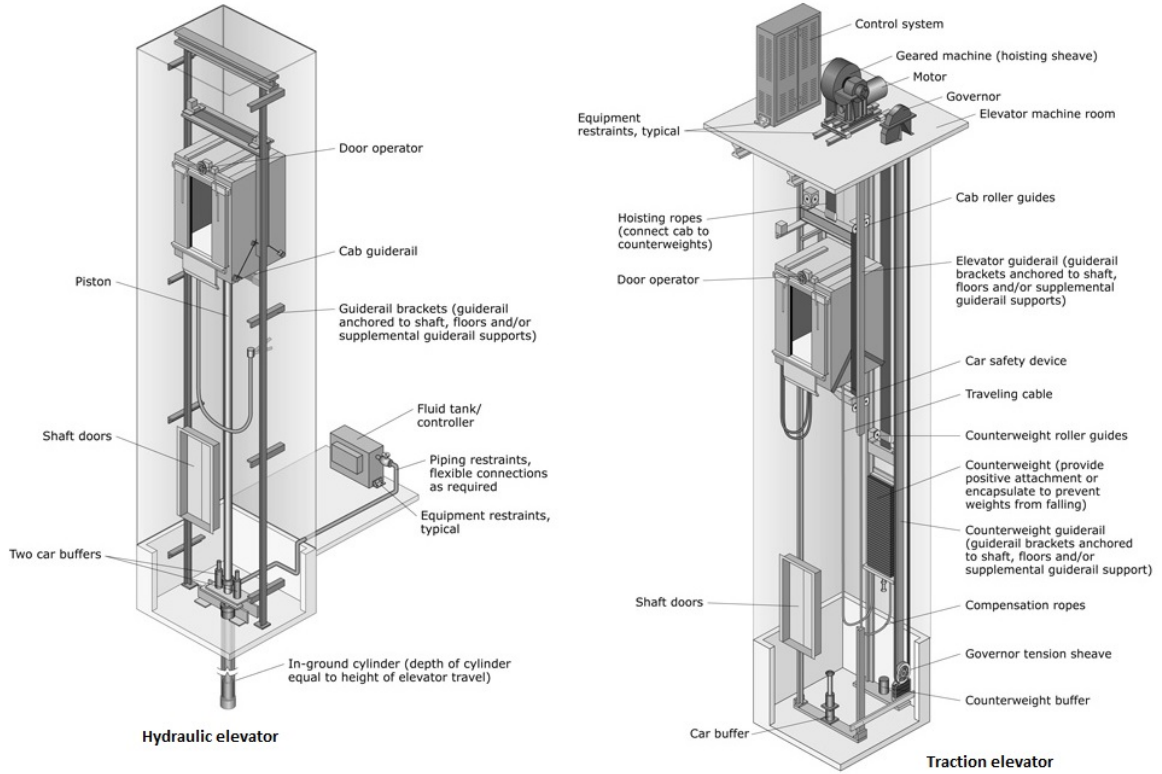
Diagram adapted from [17] showing basic construction of hydraulic and traction elevators.
